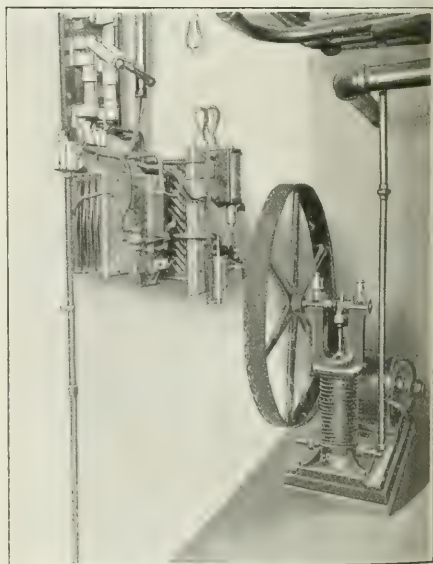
Motor-Driven Vacuum Pump and Control Apparatus
